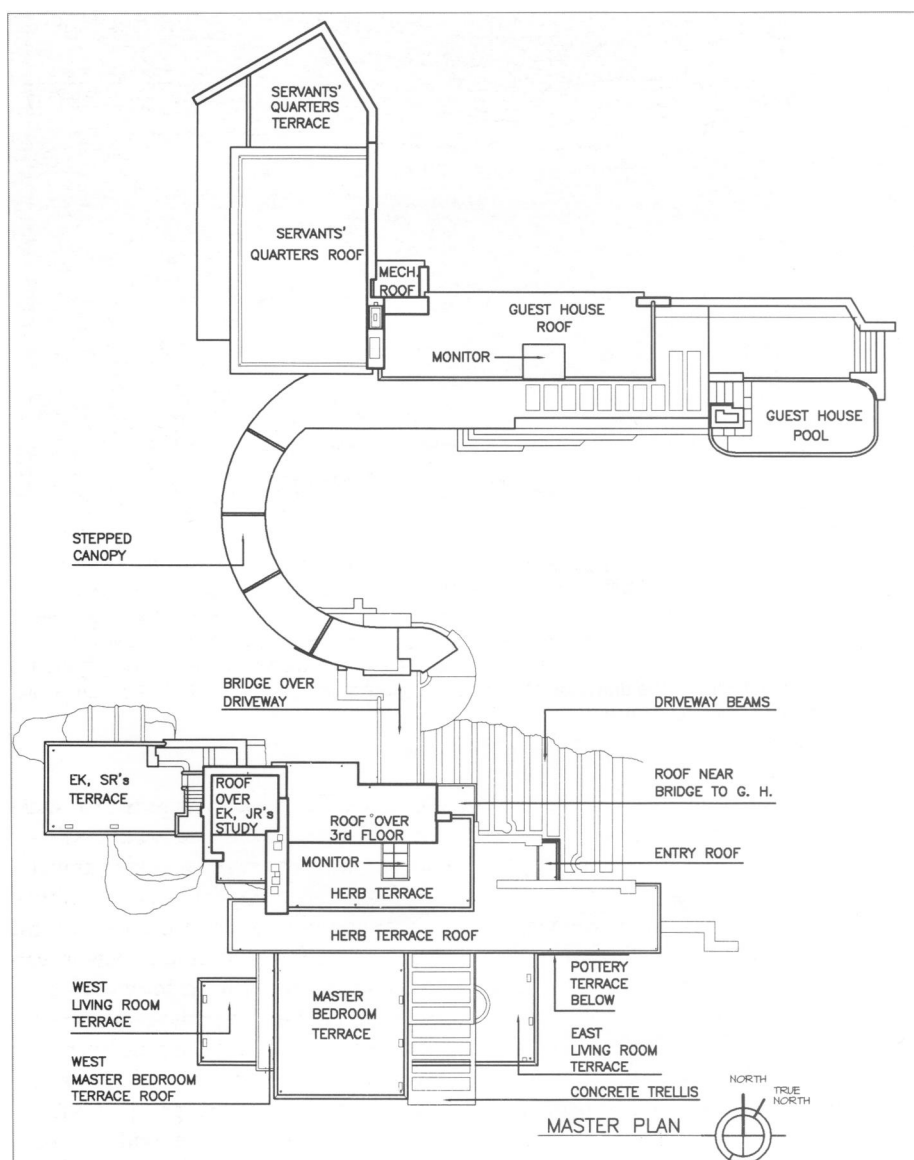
Plan of Fallingwater. Drawing by WASA. All drawings, except as noted, used courtesy of the Western Pennsylvania Conservancy.
